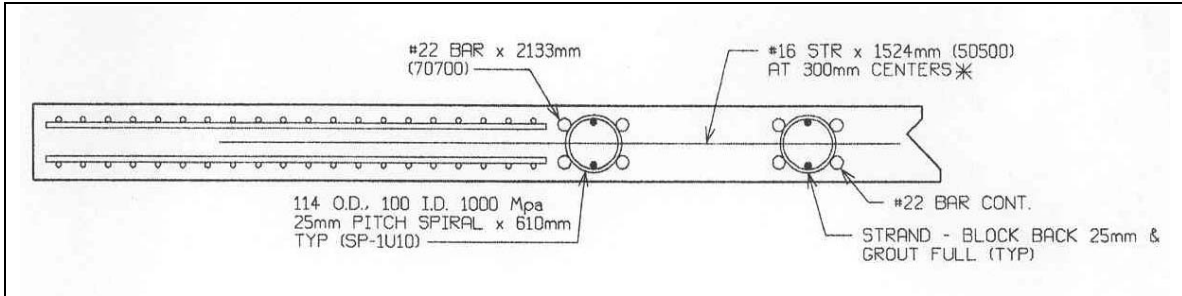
NU-Deck end panel section at overhangs (NDOR, 2003)
